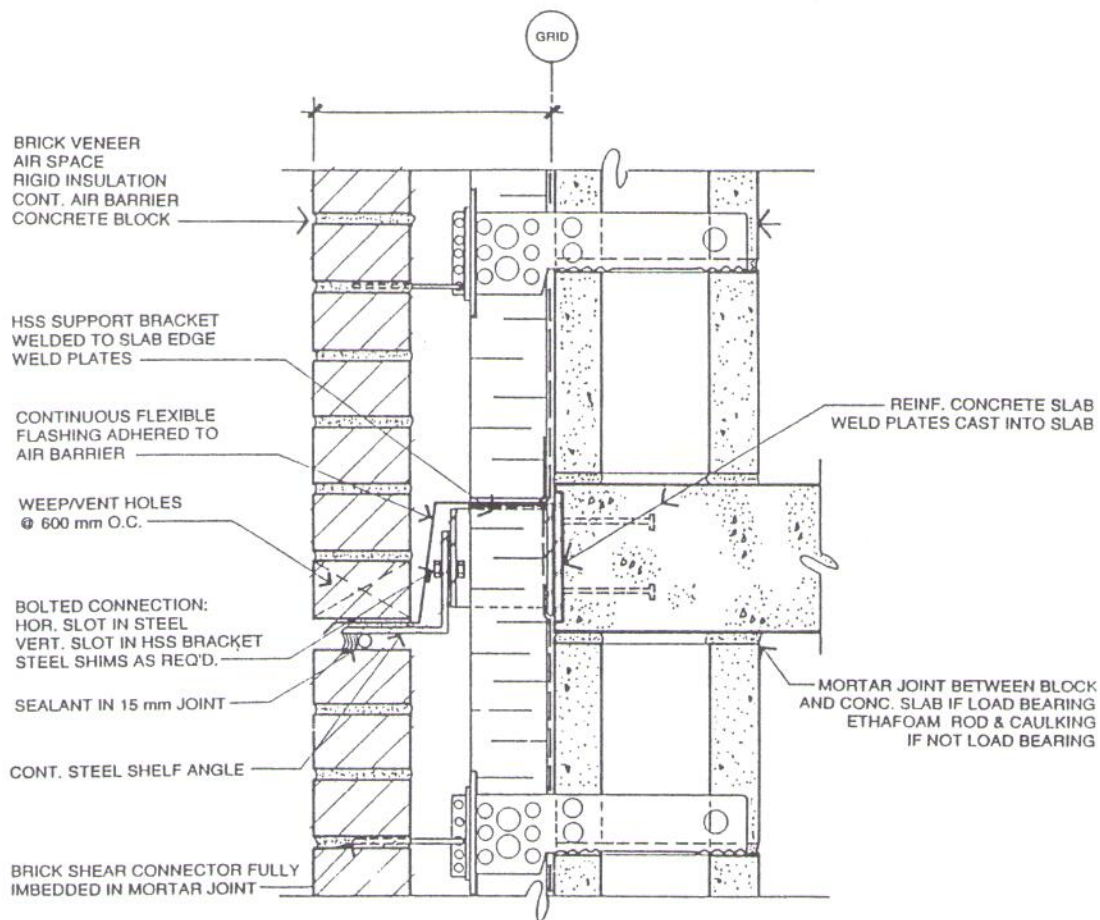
Brick Veneer/Concrete Block Detail At Slab Edge
